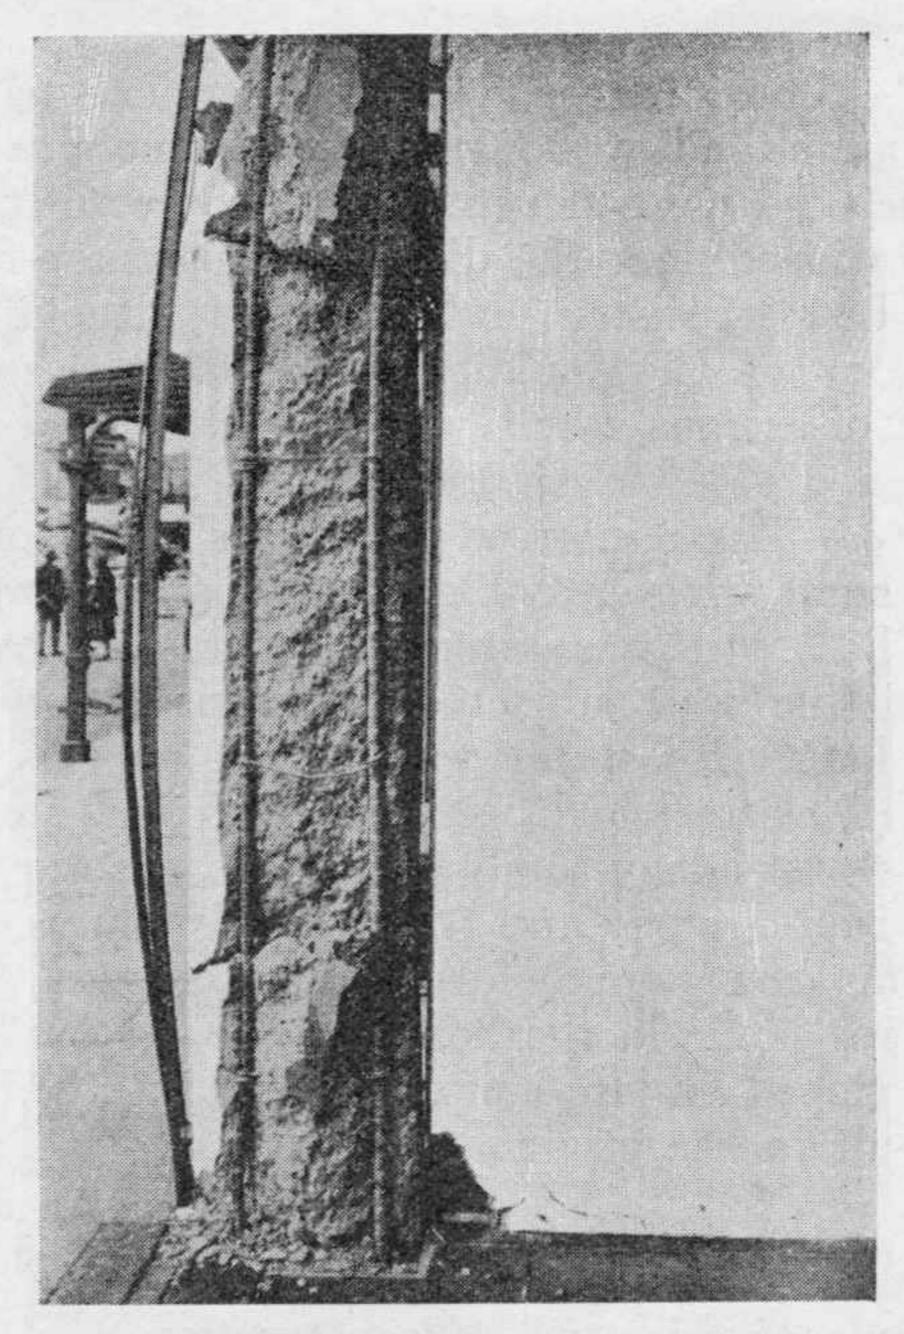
Typical failure of reinforced concrete column.
